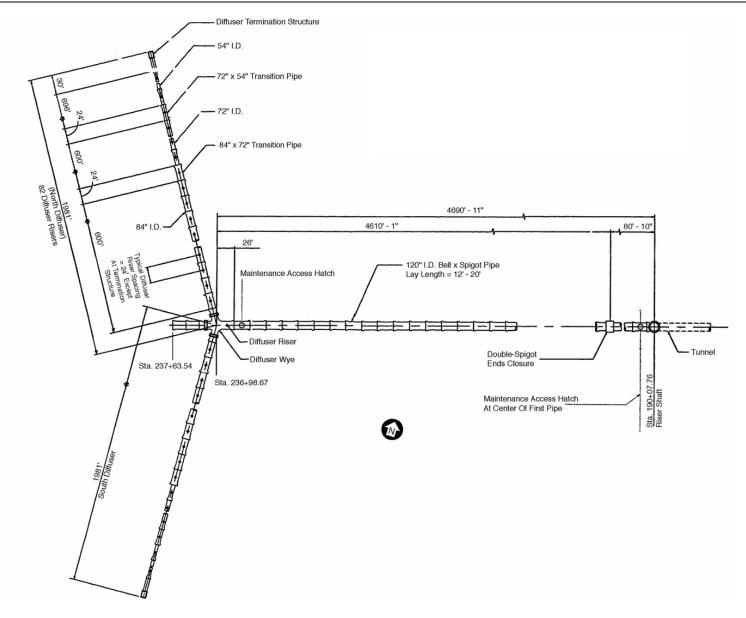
Engineering drawings of the terminal end of the SBOO and wye diffuser array.
